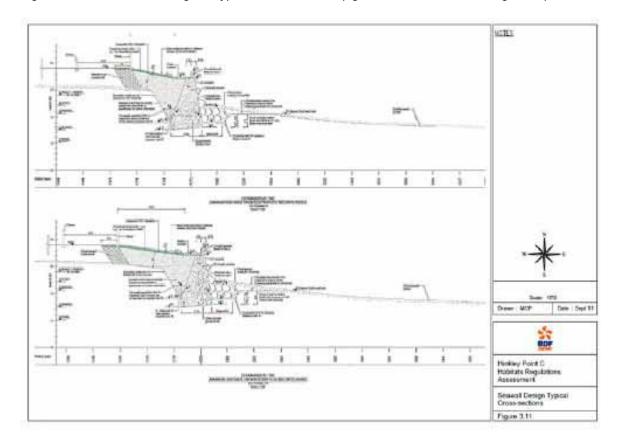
Sea Wall Design – Typical Cross-section (figure taken from Haskoning, 2011)
